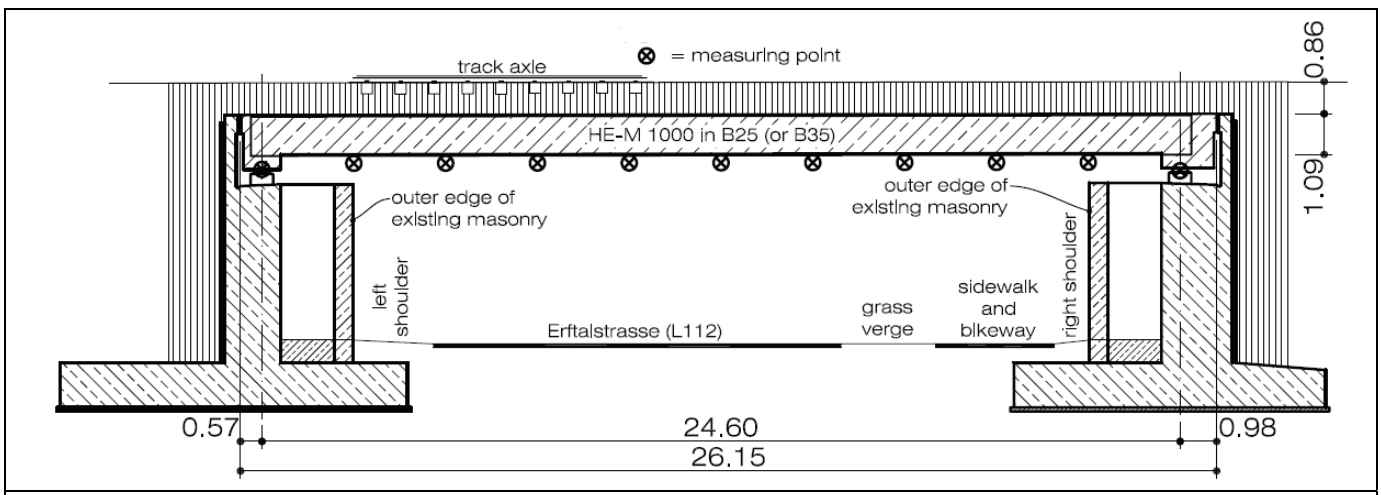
Erfttal-Bridge, longitudinal section. Dimensions in meters.
